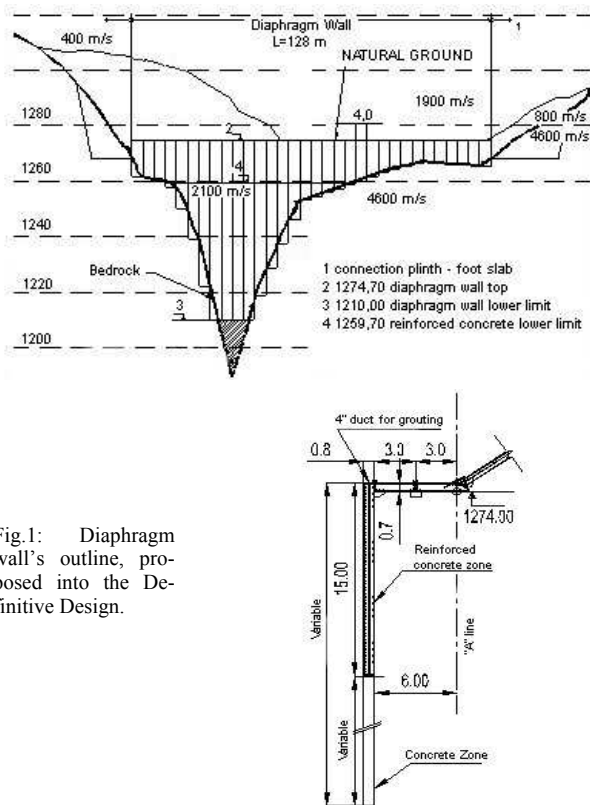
Diaphragm wall's outline, proposed into the Definitive Design.
